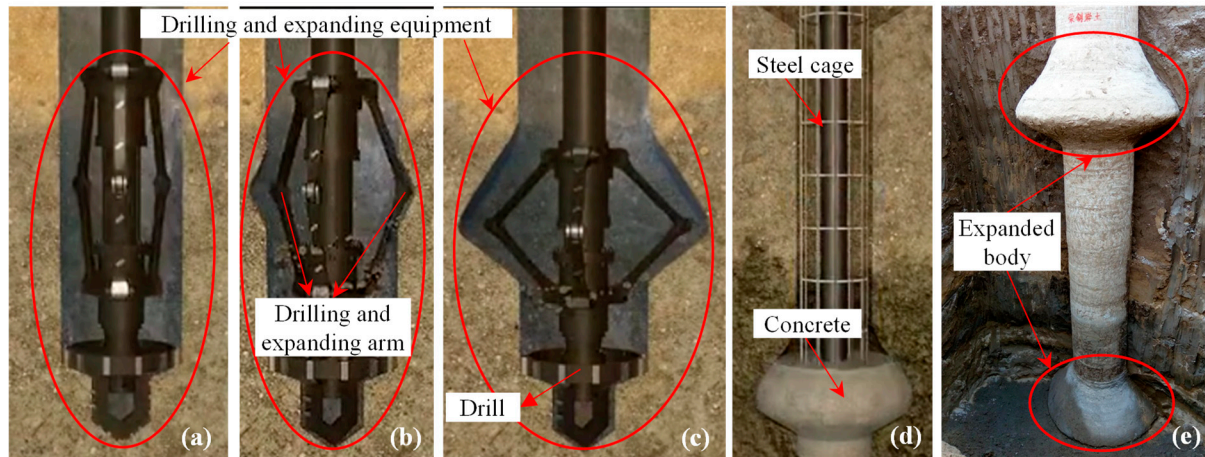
The process of creating a drill-expanded concrete pile and a photo of a real pile: (a) drilling the hole; (b) expanding the hole; (c) expanding completed; (d) pouring concrete; (e) photo of a real drill-expanded concrete pile.
